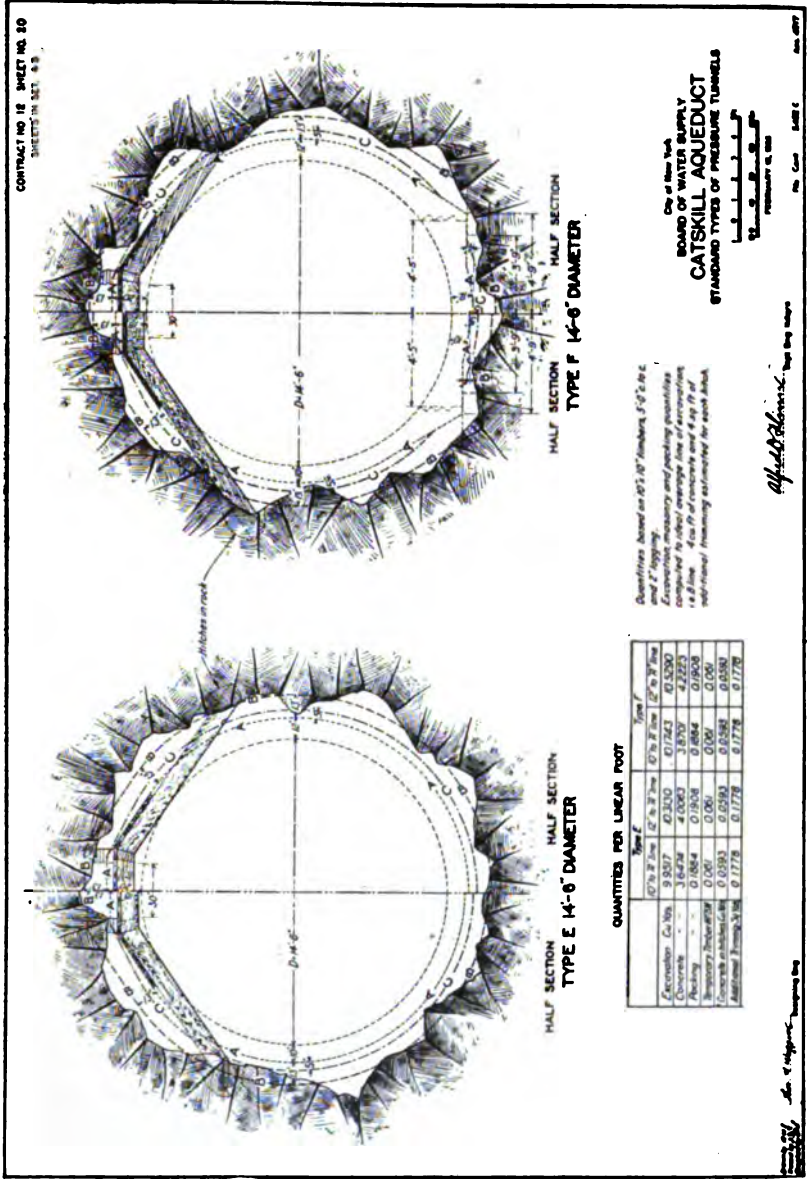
Cross-section of Pressure Tunnel Showing Section where Temporary Timbering is Used. Type "F," designed to be placed while excavation is in progress not used.
